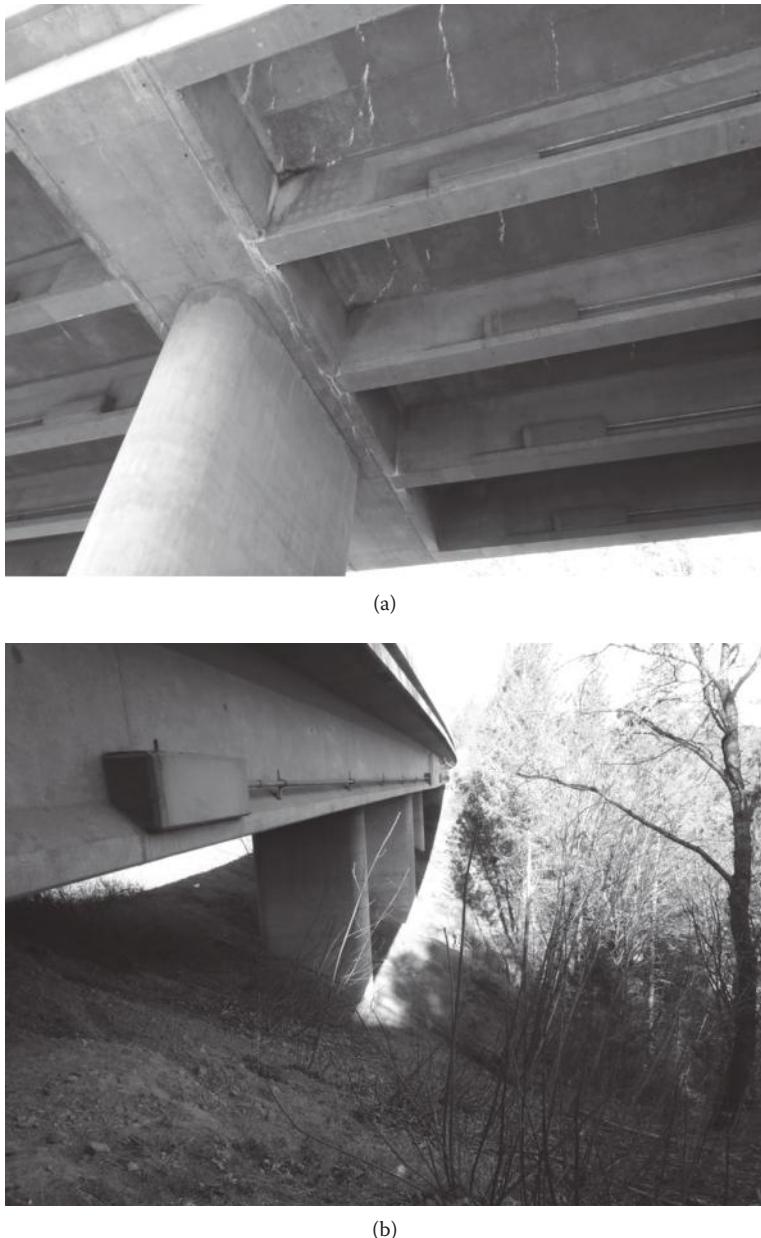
Island View Sidehill Viaduct strengthened by external prestressing: (a) girder bottom view, (b) girder side view.
